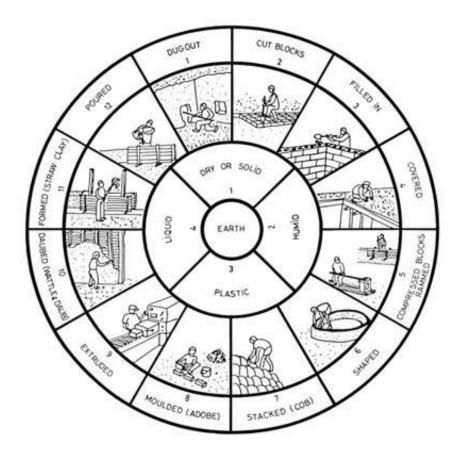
12 principal earth construction technique (Auroville Earth Institute, 2018)
